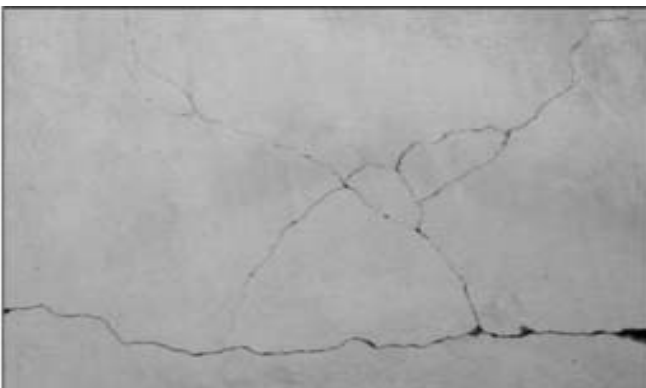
Typical blasting X-cracks developed at the RCC structure at Kusmunda mine
